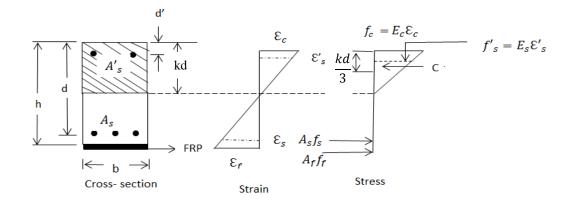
Strain and stress distribution for strengthened reinforced concrete beam The added FRP plate provides more strength to the concrete beam section. Thus, the application of this FRP as detailed in Figure 5.2 will lead to a change in the neutral axis in the beam. This neutral axis can be determined with the equation below;
